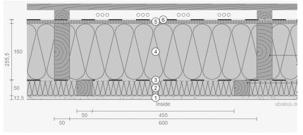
Timber frame panel construction - wall (1 - plasterboard 12.5mm; 2 - mineral wool 50 mm; 3 - vapor barrier 0.5mm; 4 - mineral wool 180 mm; 5 - OSB 12mm; 6 - windproof film)
